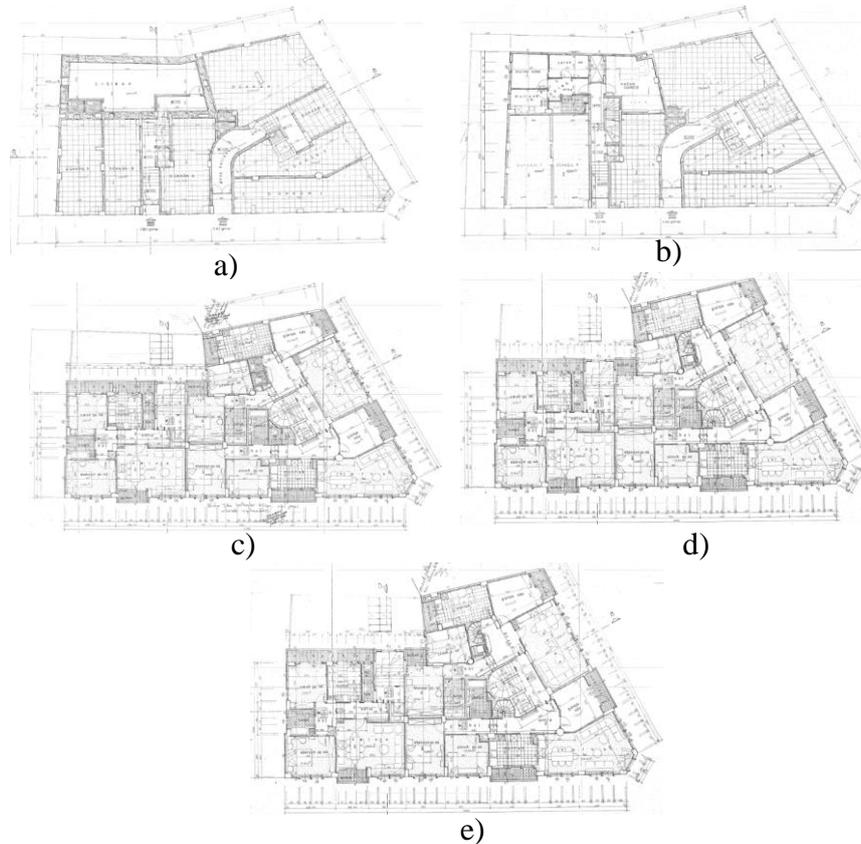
Sections of structure floors a) first floor b) second floor c) third floor d) fourth floor e) fifth floor.
